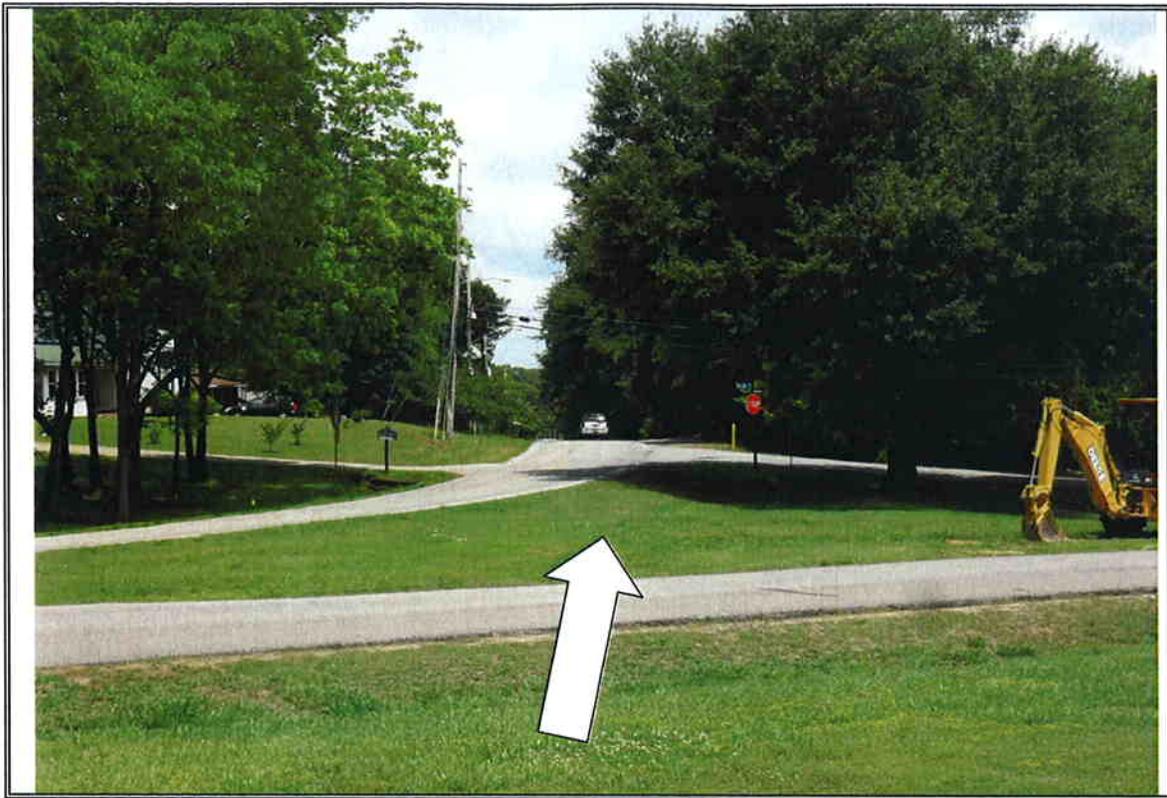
View looking northwest from the historic museum structure towards the Project Site and Mt Moriah Road.
